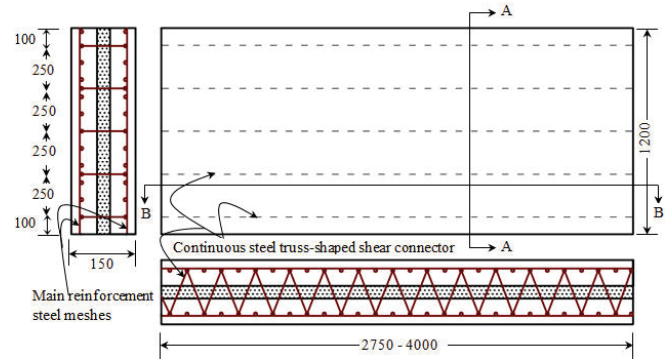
Details of the one-way PFCSP slab (e.g. $L/b = 2.292$)
